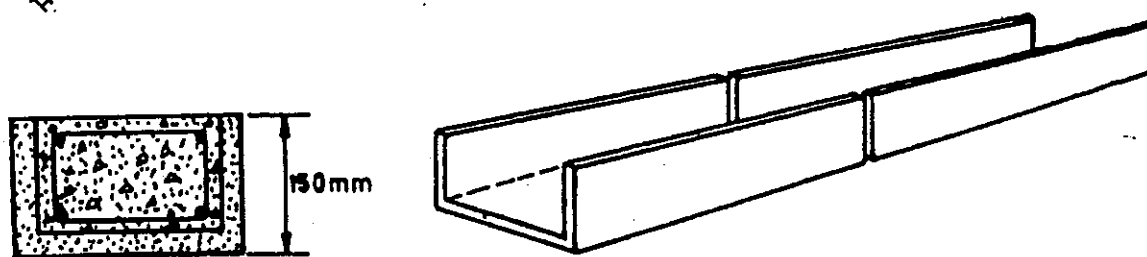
U-BLOCKS FOR HORIZONTAL BANDS
